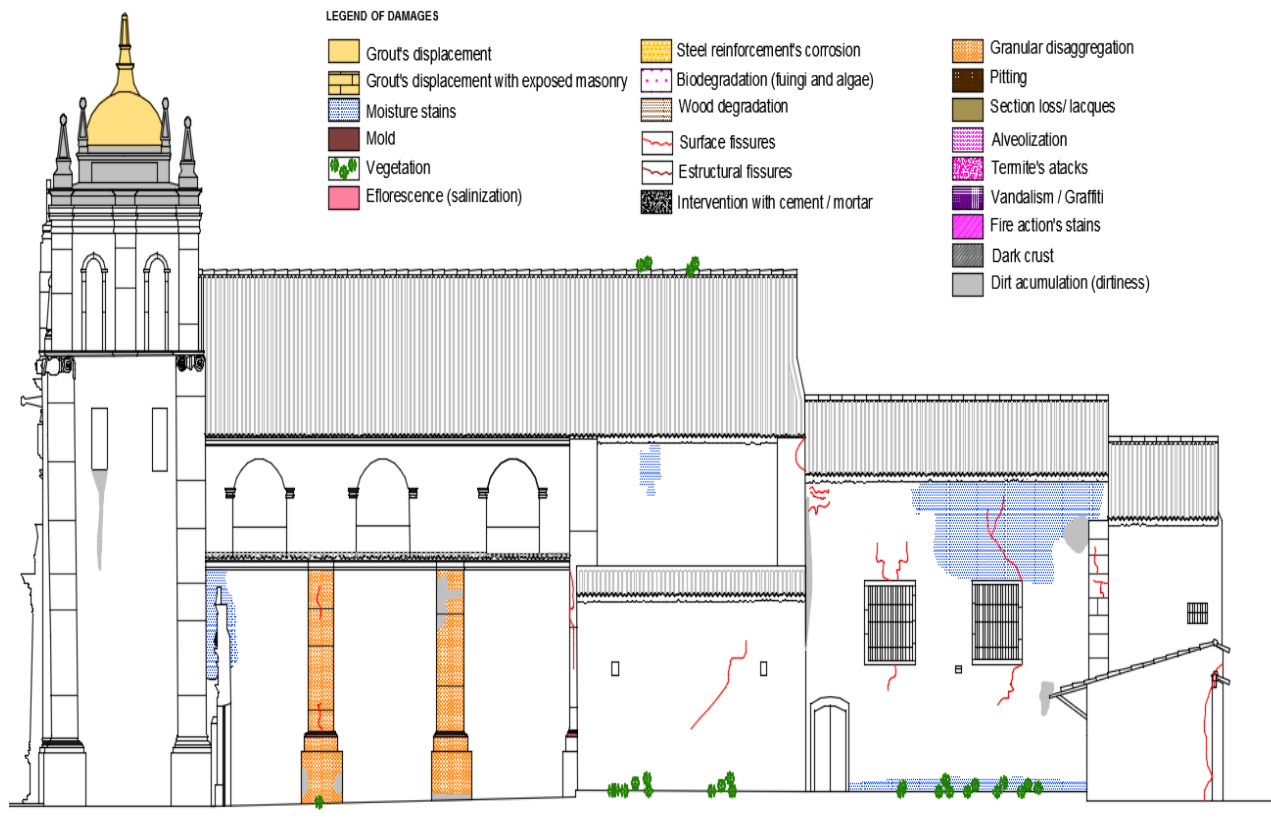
Damage's Map of Our Lady of Carmo's Church – West Facade..
